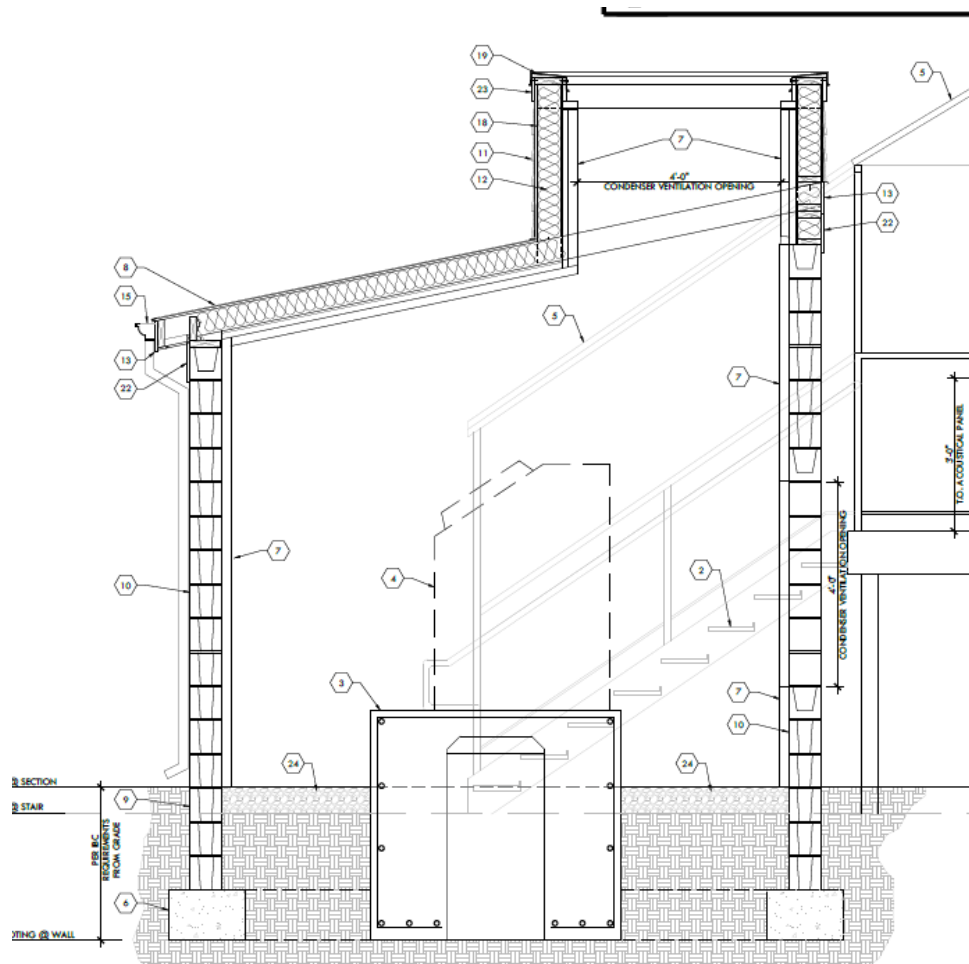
Section of the proposed structure showing the vent at the top of the structure.
